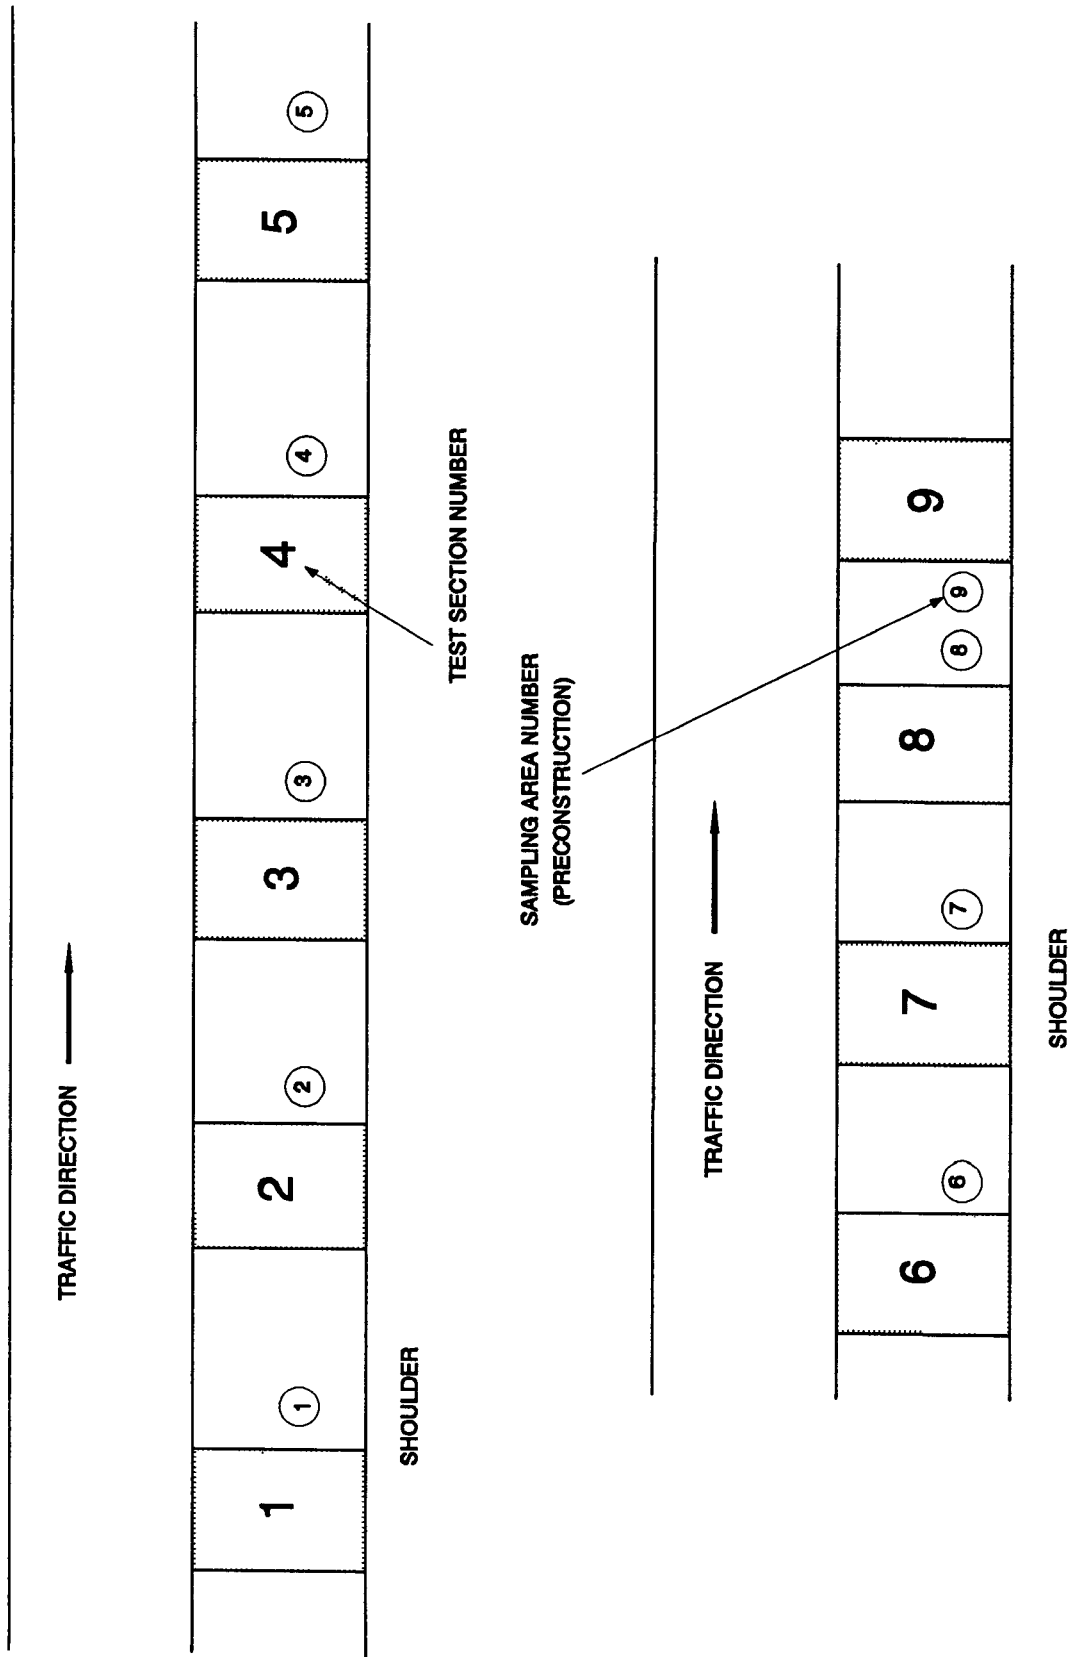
Example of "Pre-Construction" Sampling Area Plan
